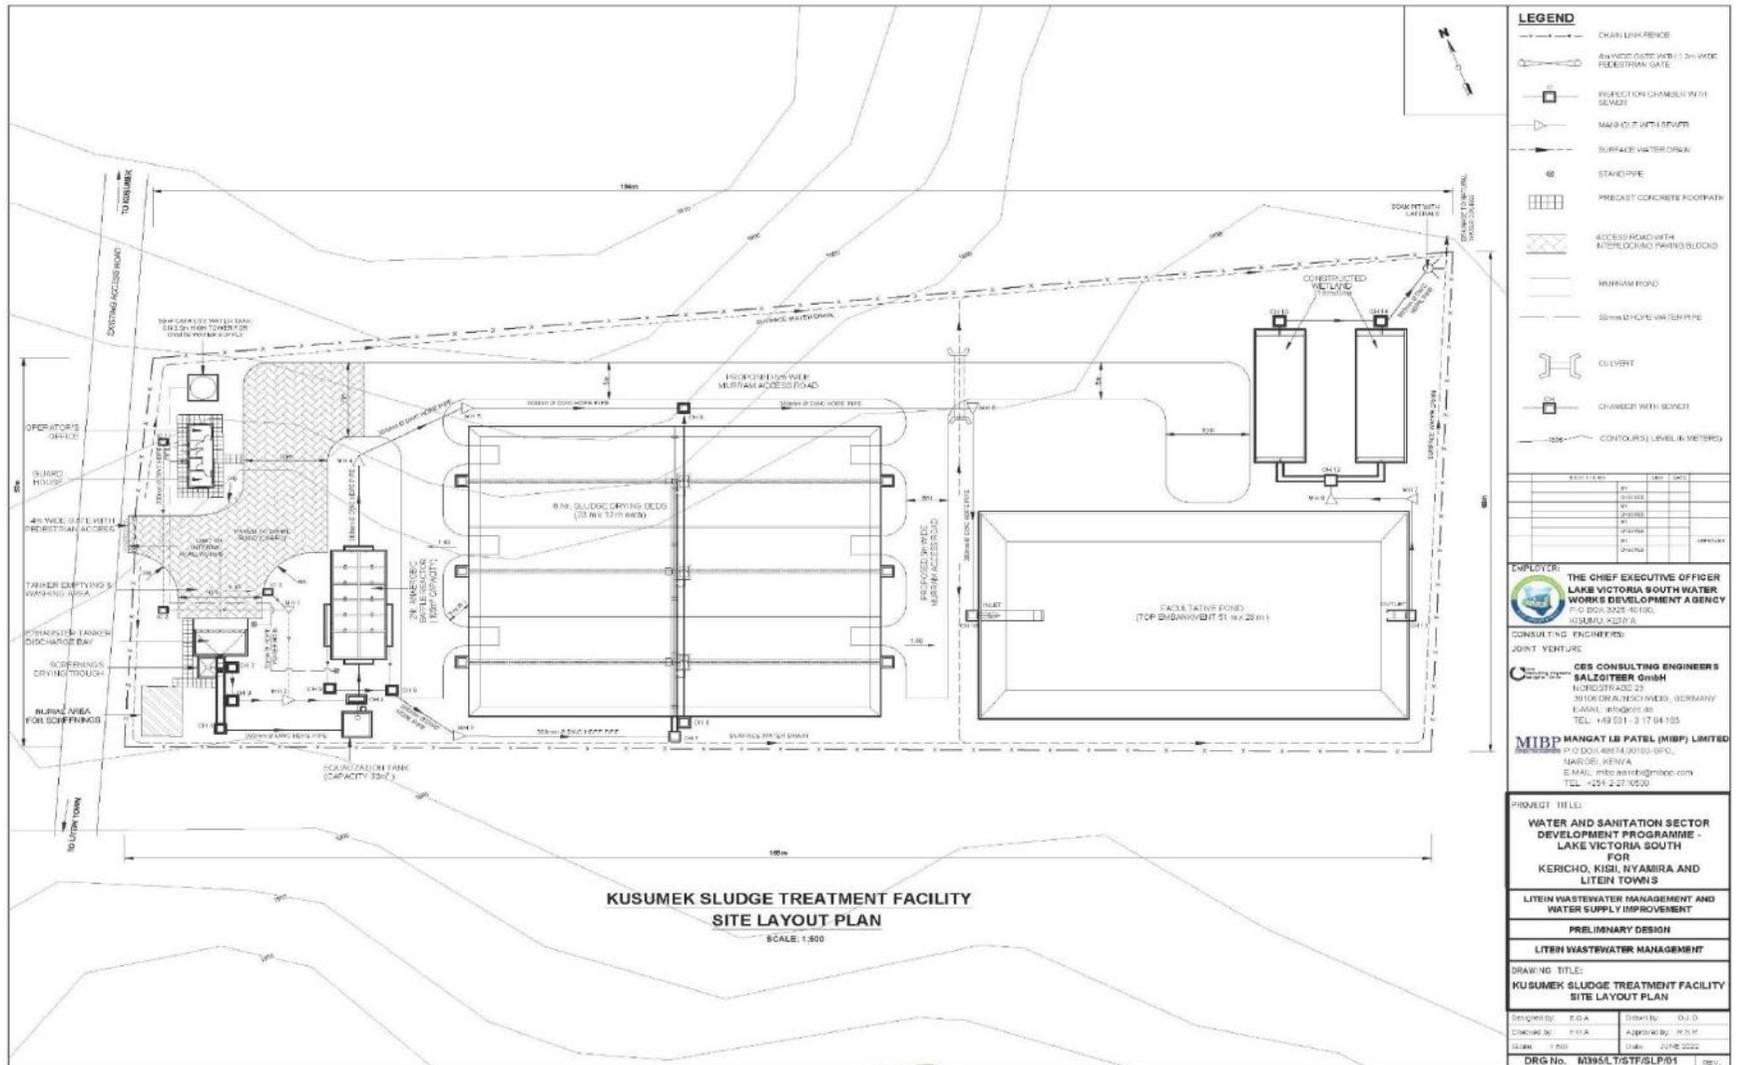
Layout Plan of Proposed Sludge Treatment Facility
